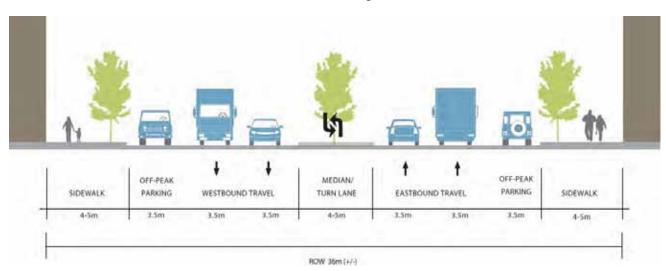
Cross-section for Lake Shore Boulevard Alternative 2 – Parliament Street to Don River (facing west)
